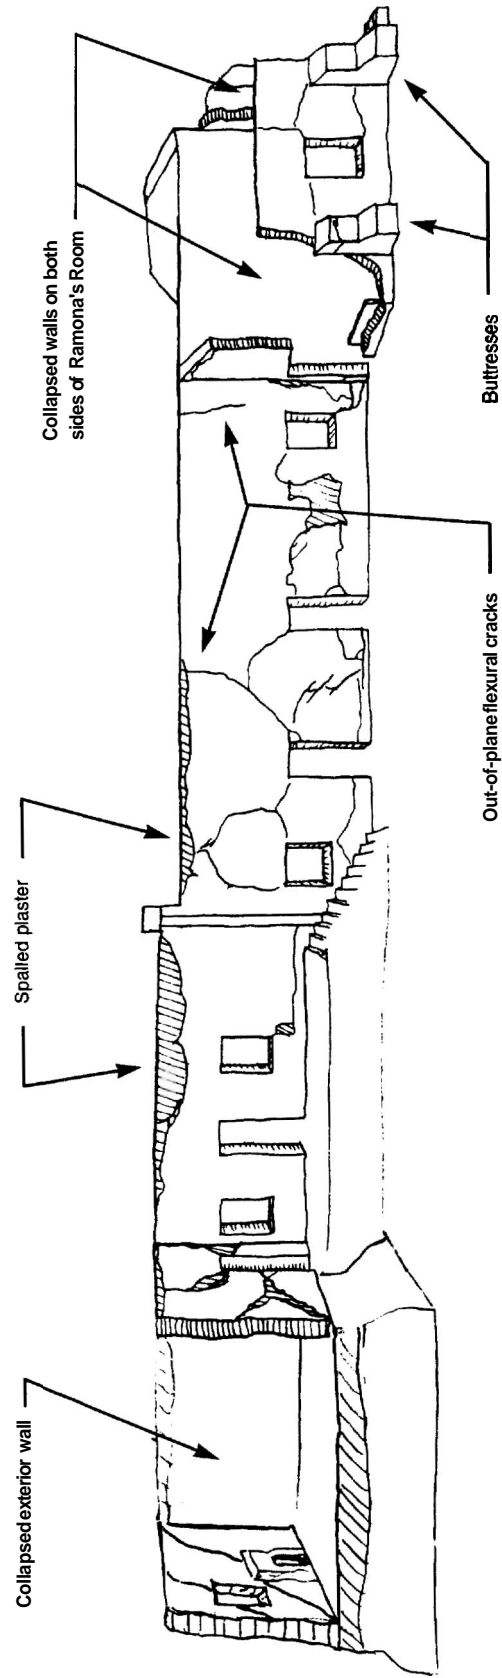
Drawing of Del Valle Adobe at Rancho Camulos. south elevation.
